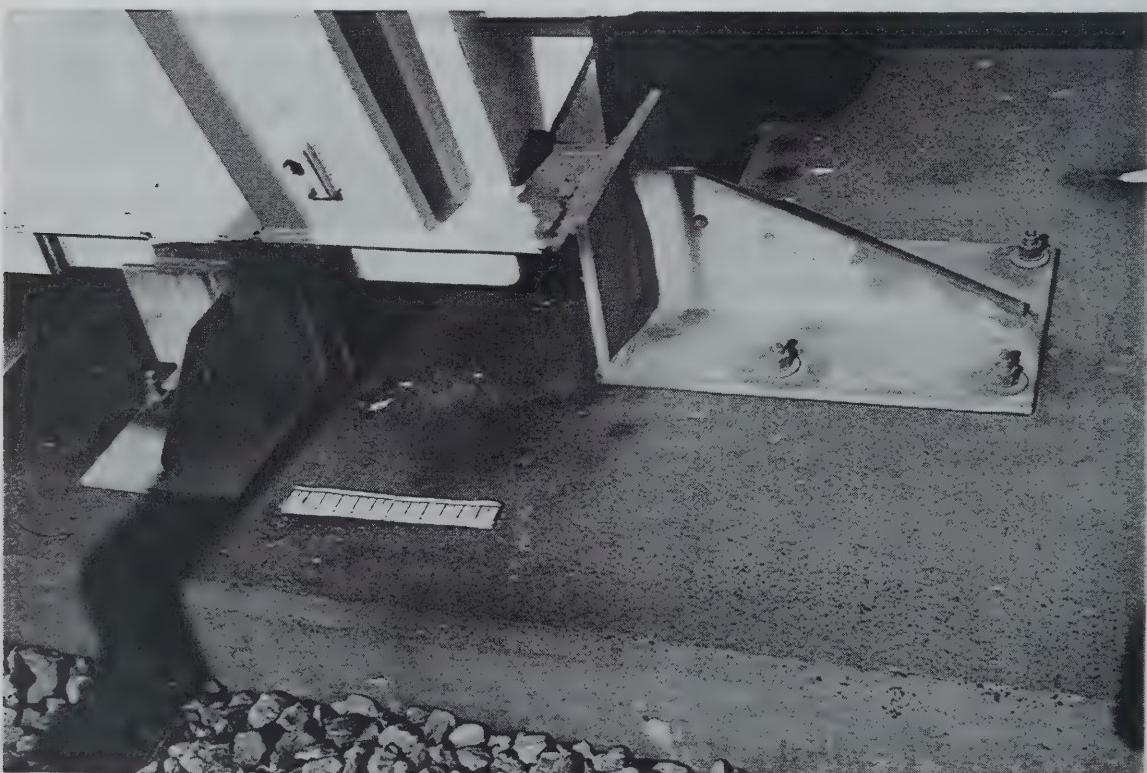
A bracket with a gusset was welded to a stiffener on the transformer case and bolted to the foundation slab.
